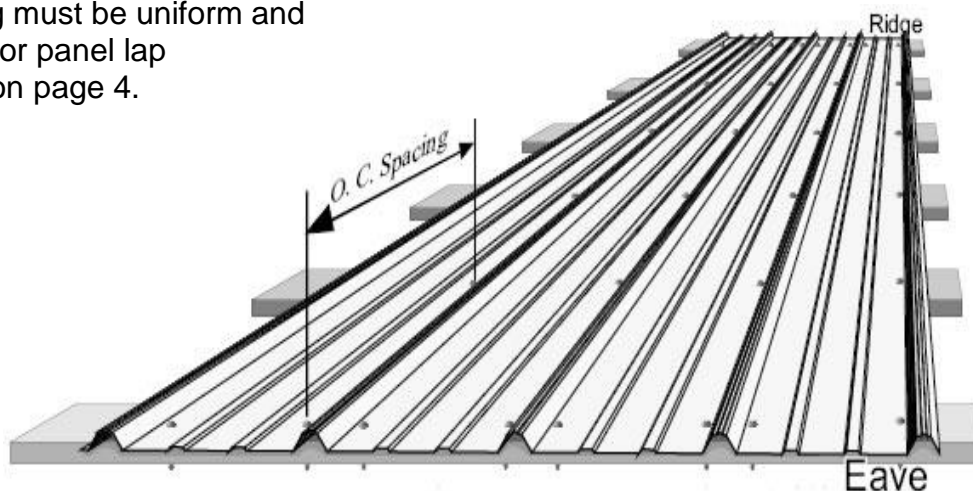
Screws should be placed on both sides of the ribs at both eave and ridge.
